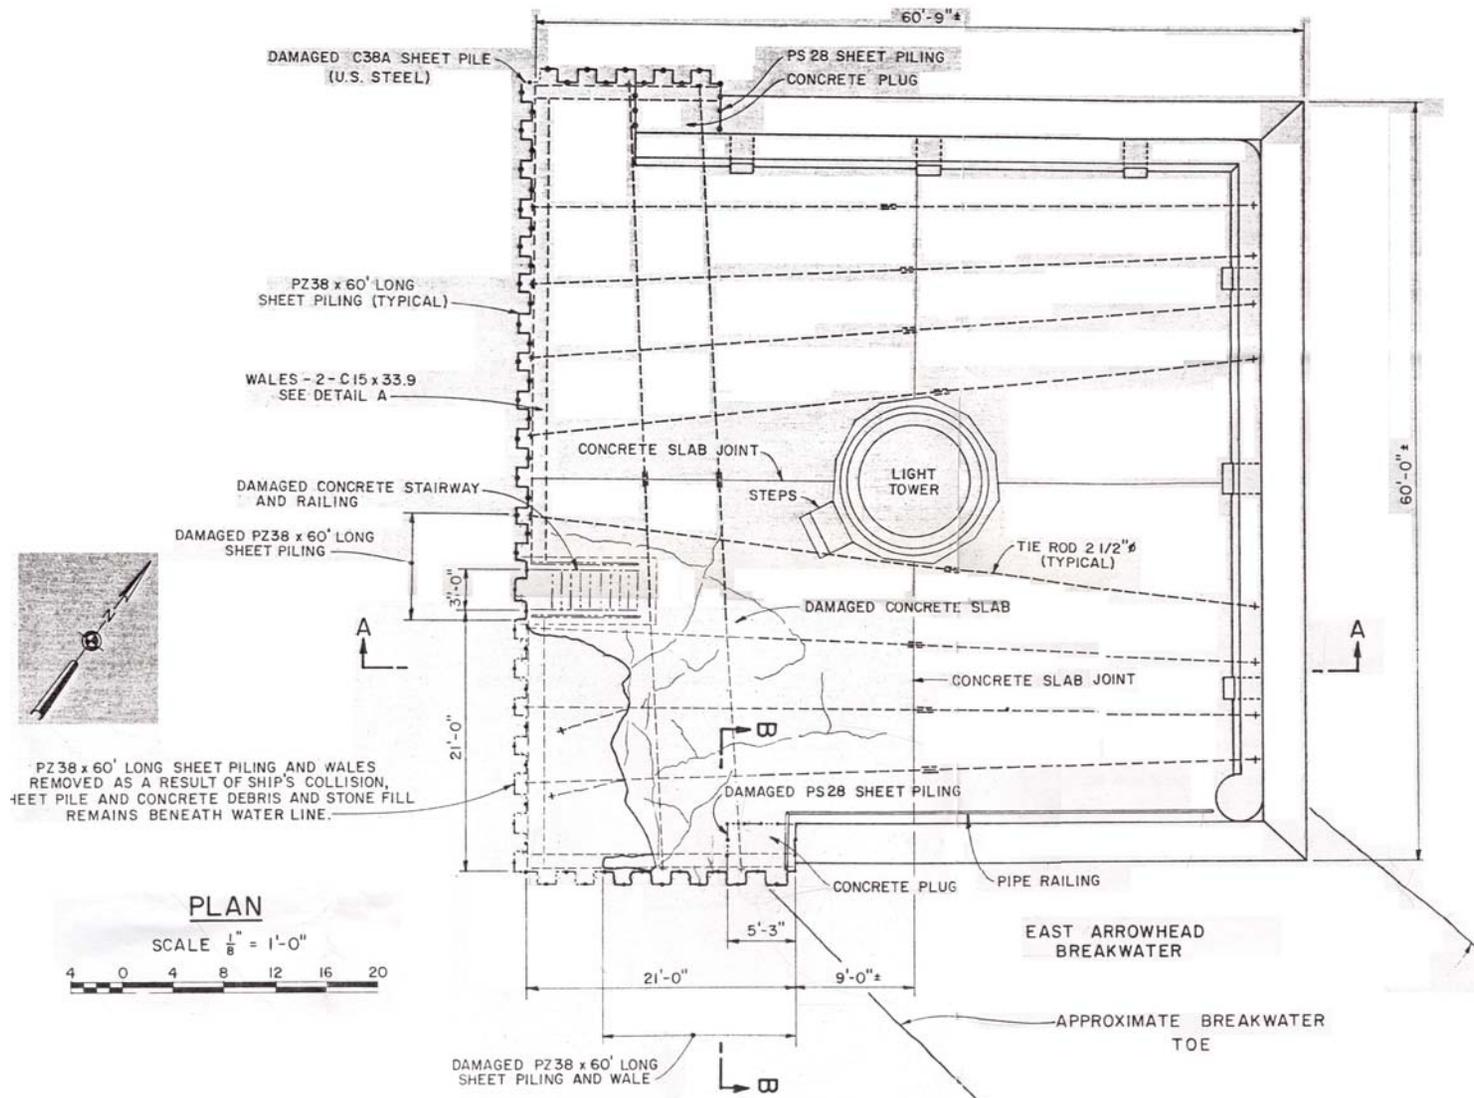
East pierhead damaged section from 1980 and the completed repairs
